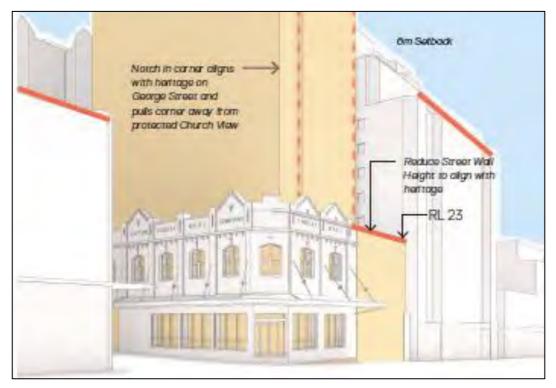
Proposed Setback and Street Wall Height Source: Grimshaw
